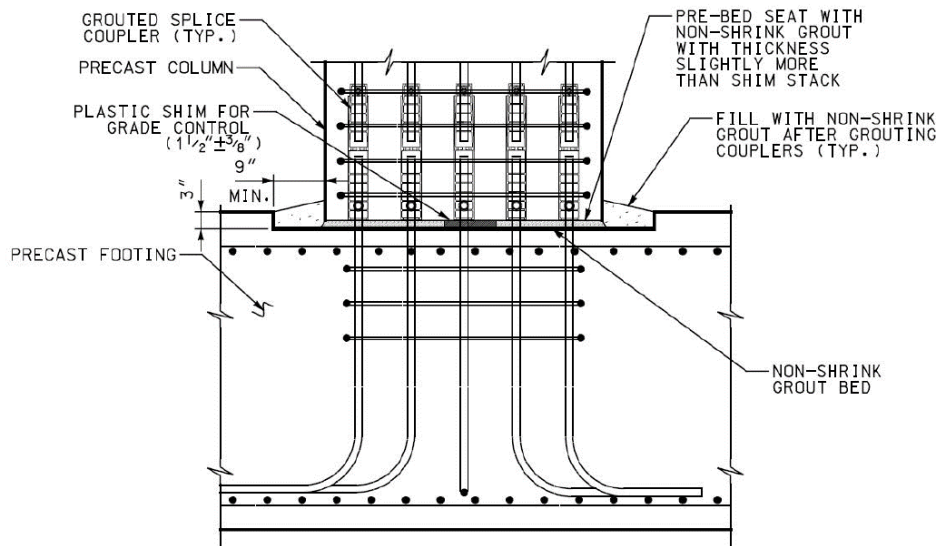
Recessed precast column to precast footing connection (PCINE 2006)
